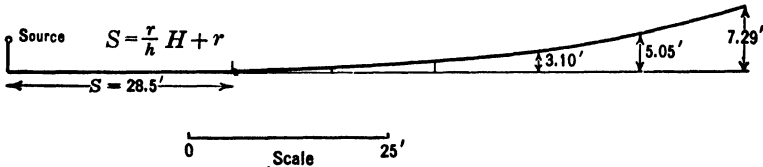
Elevation of floor for satisfactory hearing in an auditorium.
